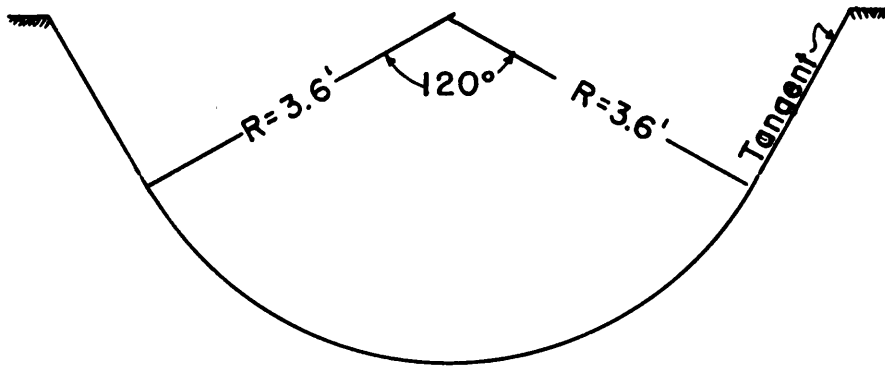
Section of hand placed concrete lined canal with reinforcing, Cameron County Water Improvement District number eleven
